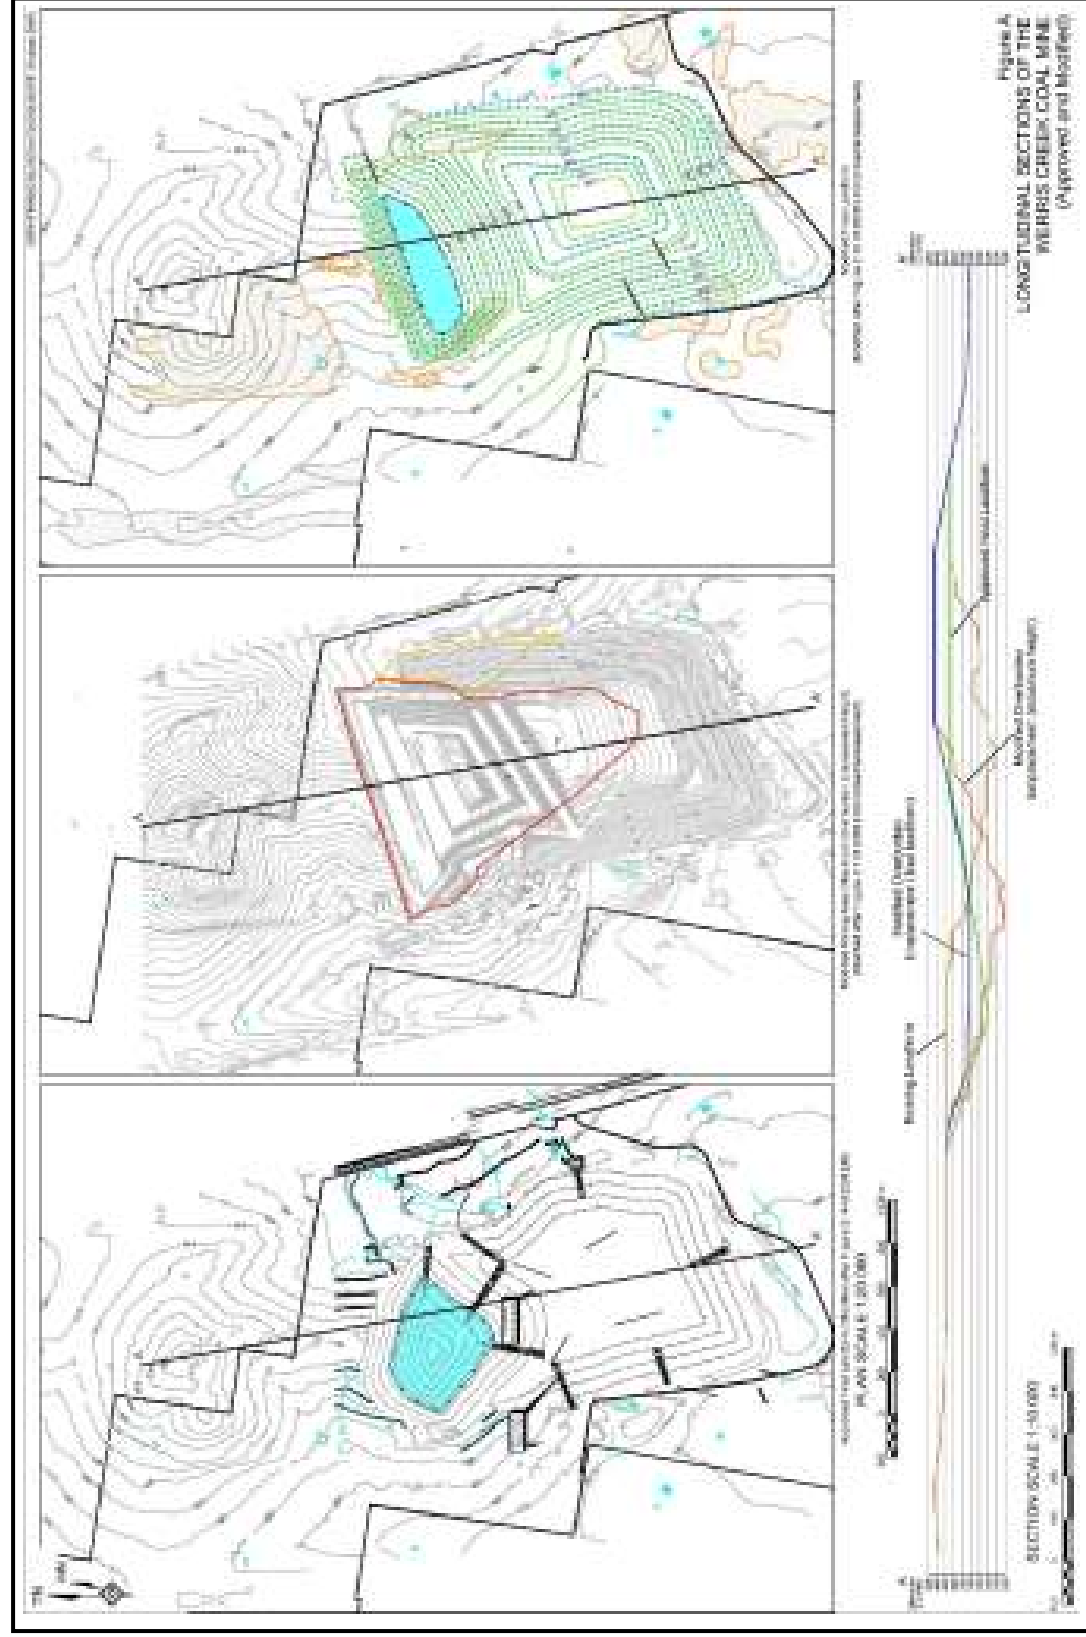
Plan and Sections of Approved and Proposed Final Landform
